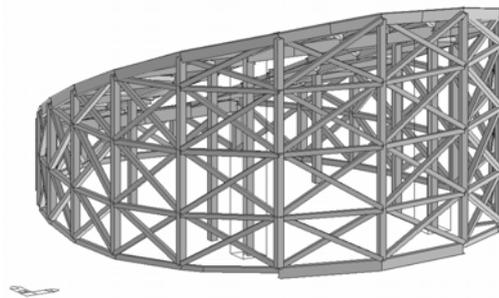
Top Steel Frame with Diagonal Braces
